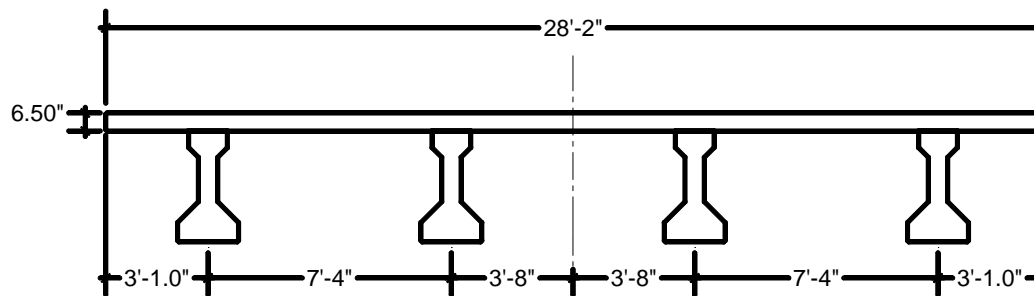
Chandler Creek Bridge Cross Section – 40' Span
